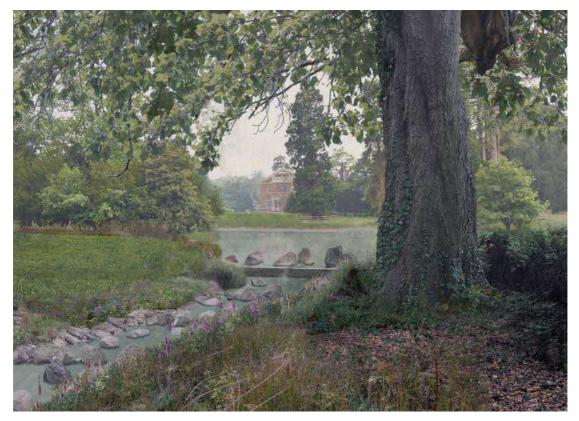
Artist's impression of the proposed weir, rock ramp fish and eel pass and landscaping viewed from the north bank looking towards South Ormsby Hall
